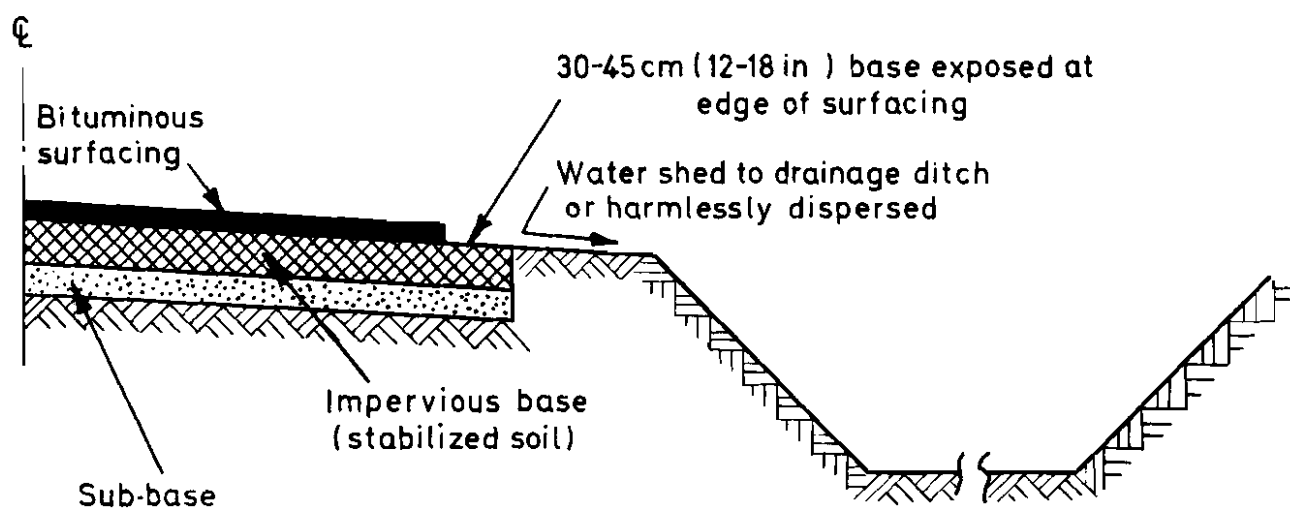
DRAINAGE OF PAVEMENT LAYERS WHEN THE BASE IS IMPERVIOUS
